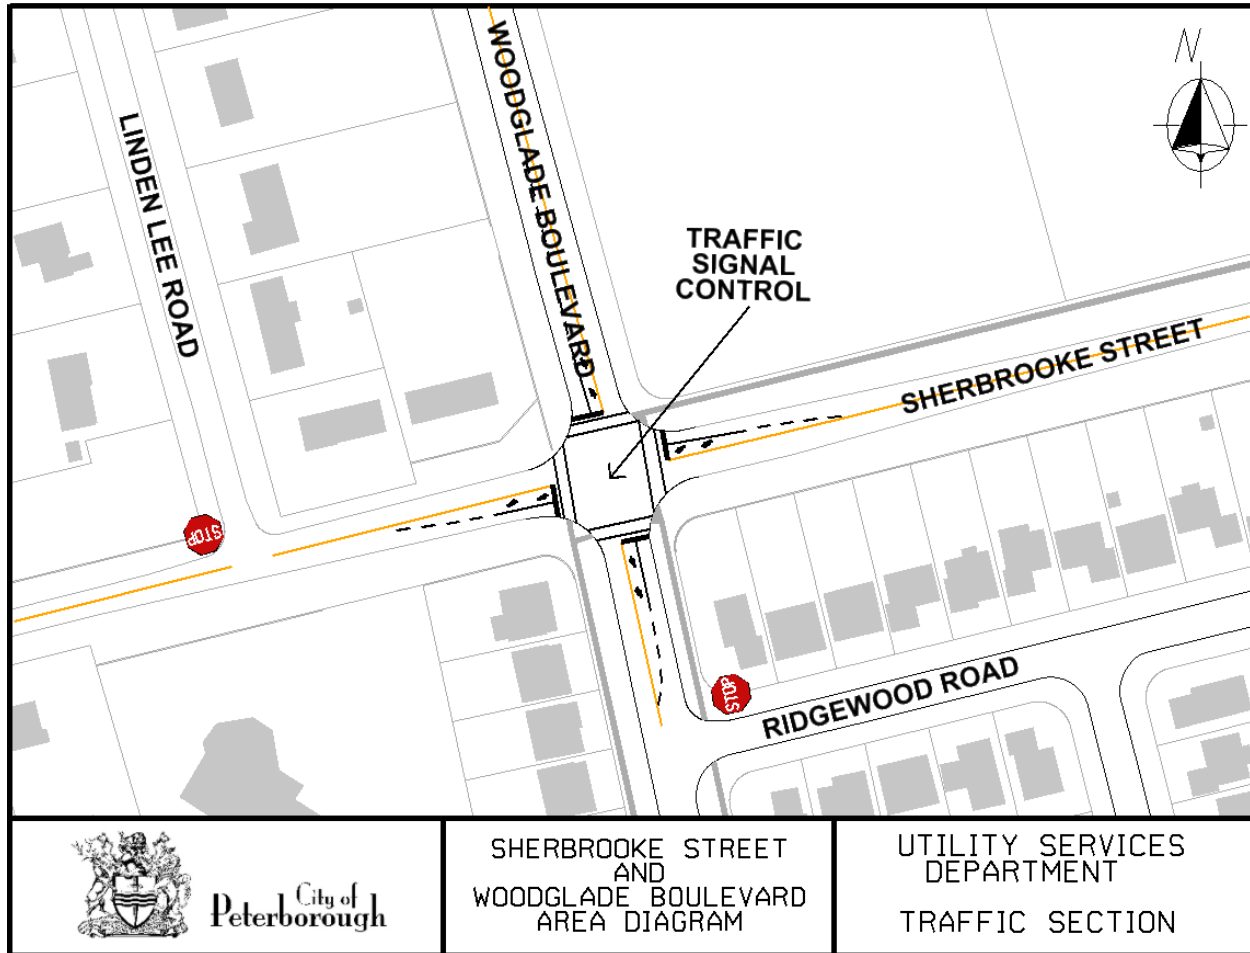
Sherbrooke Street and Woodglade Boulevard Intersection
